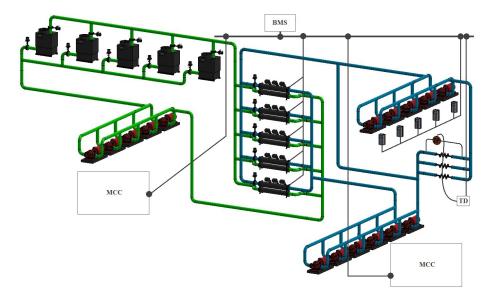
DESIGN ENVELOPE PLANT LAYOUT.
